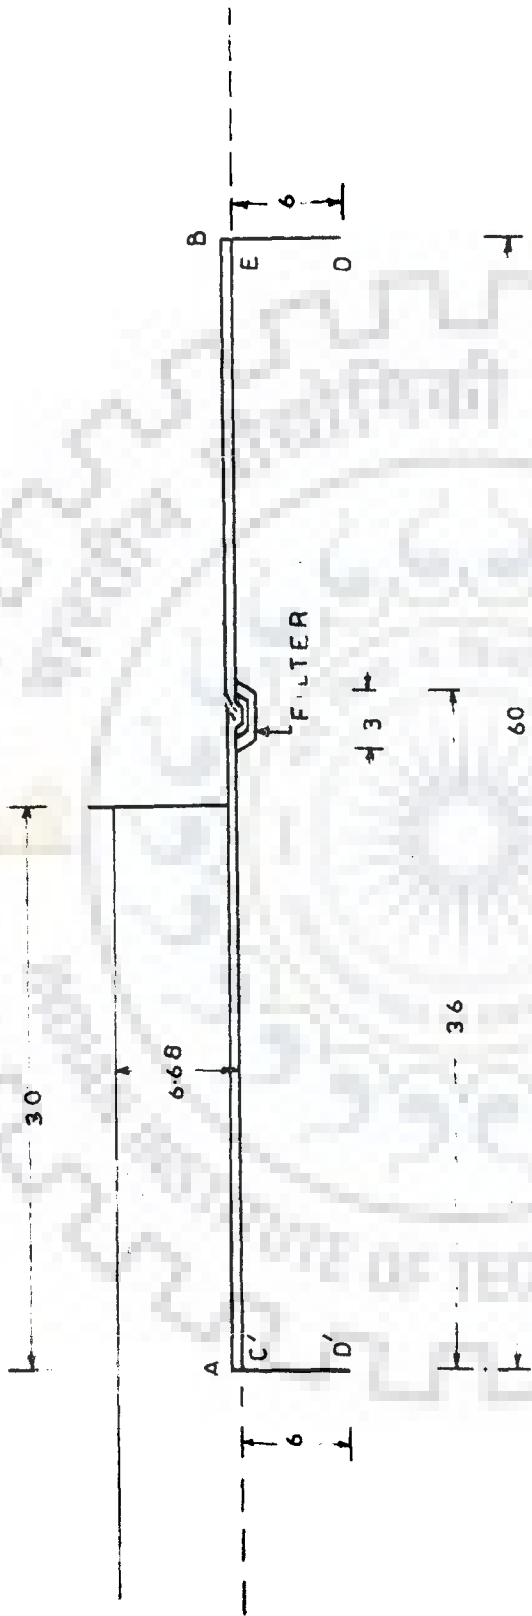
PROFILE OF HYDRAULIC STRUCTURE
